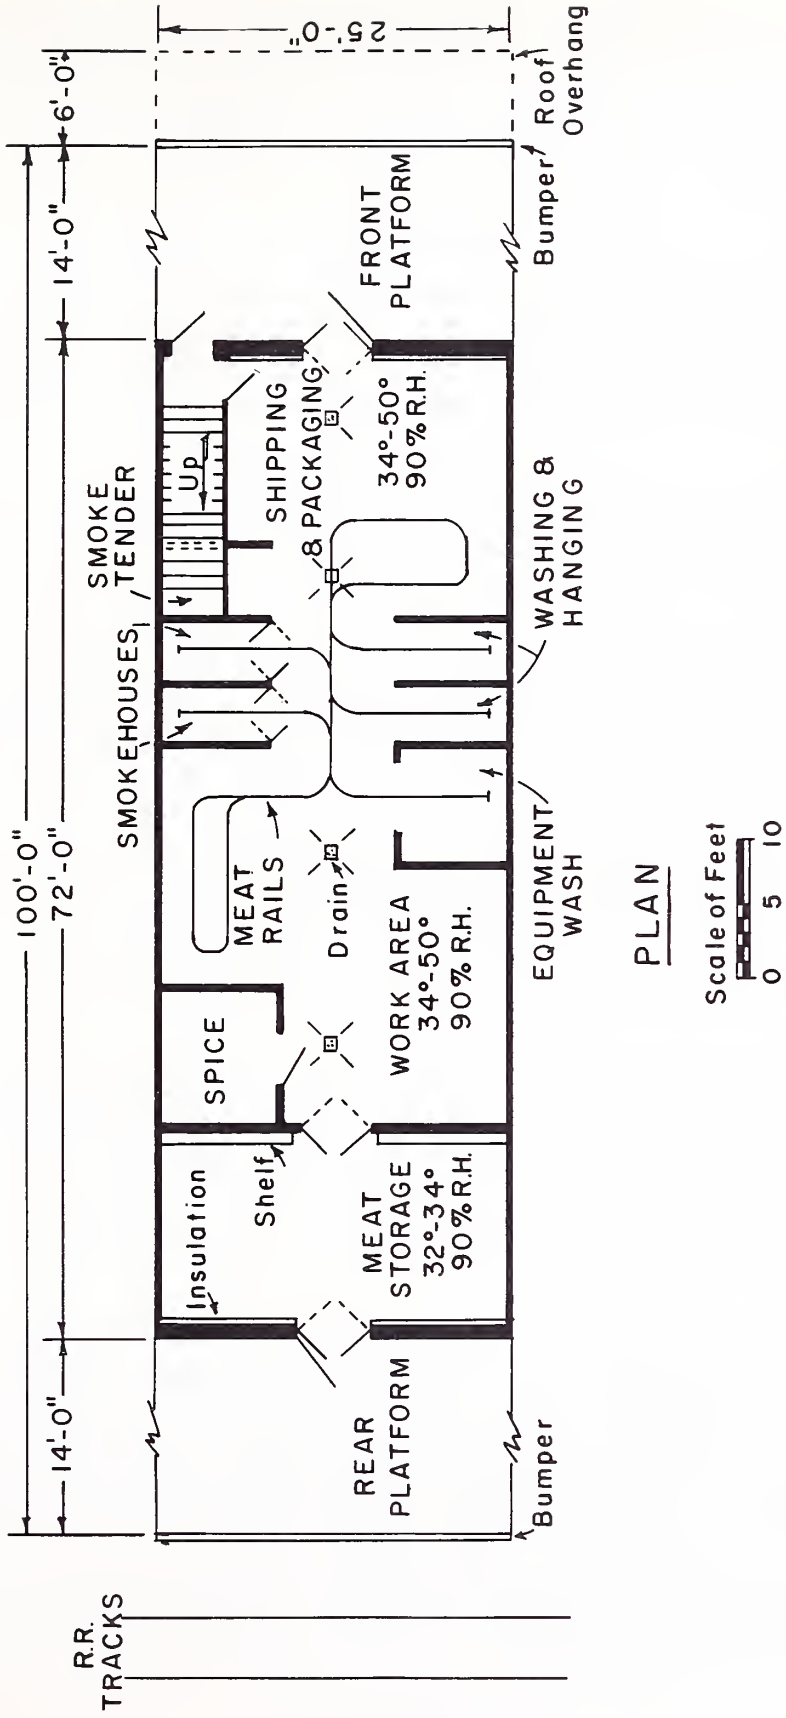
Suggested layout of a meat processing firm, showing location of equipment. Meat rails on the platform would be needed by a standard meat wholesaler.
